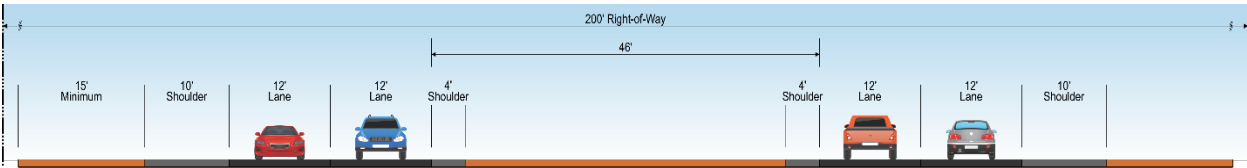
Recommended Typical Section between Perkinsville Road and Road 5N
